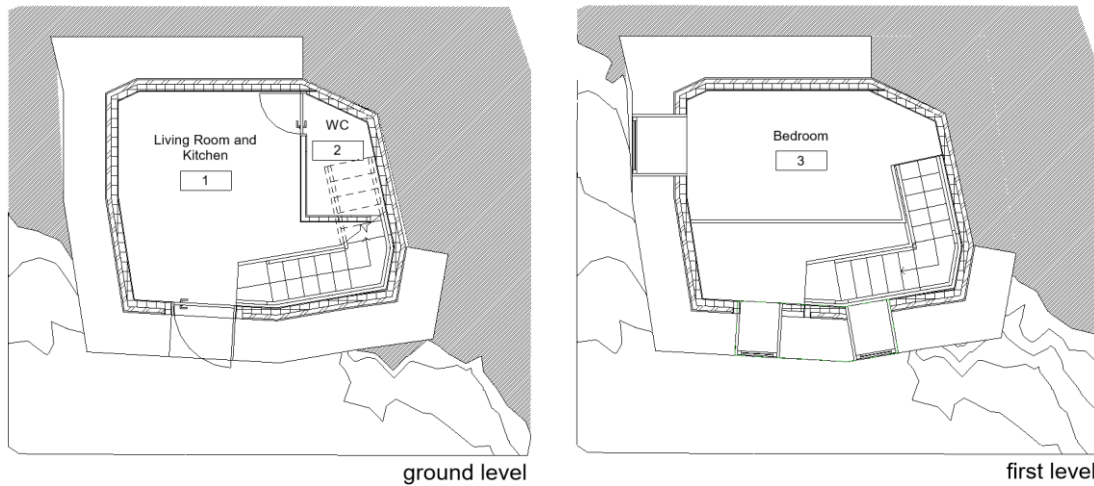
Plan views of the rehabilitation proposal (author's figure)
